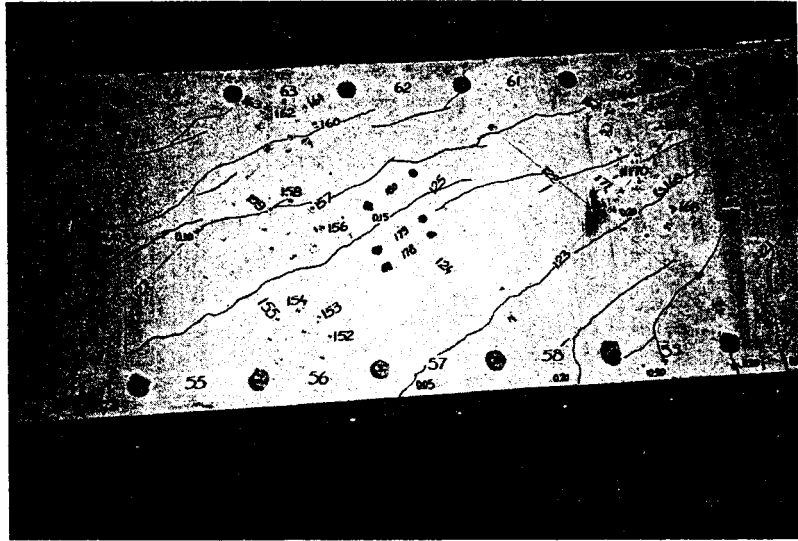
Crack pattern near failure load of prestressed beam CF1.
